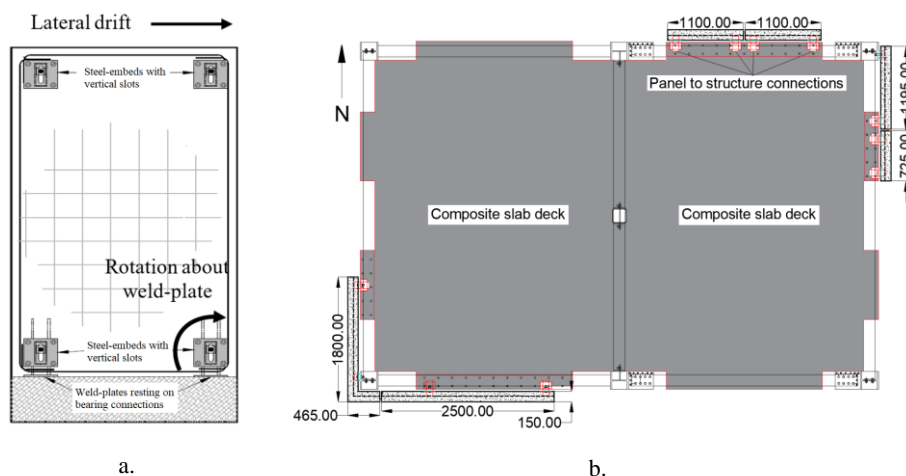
a) Novel steel connections; b) Plan showing panel configurations at two opposite corners of the test structure.
